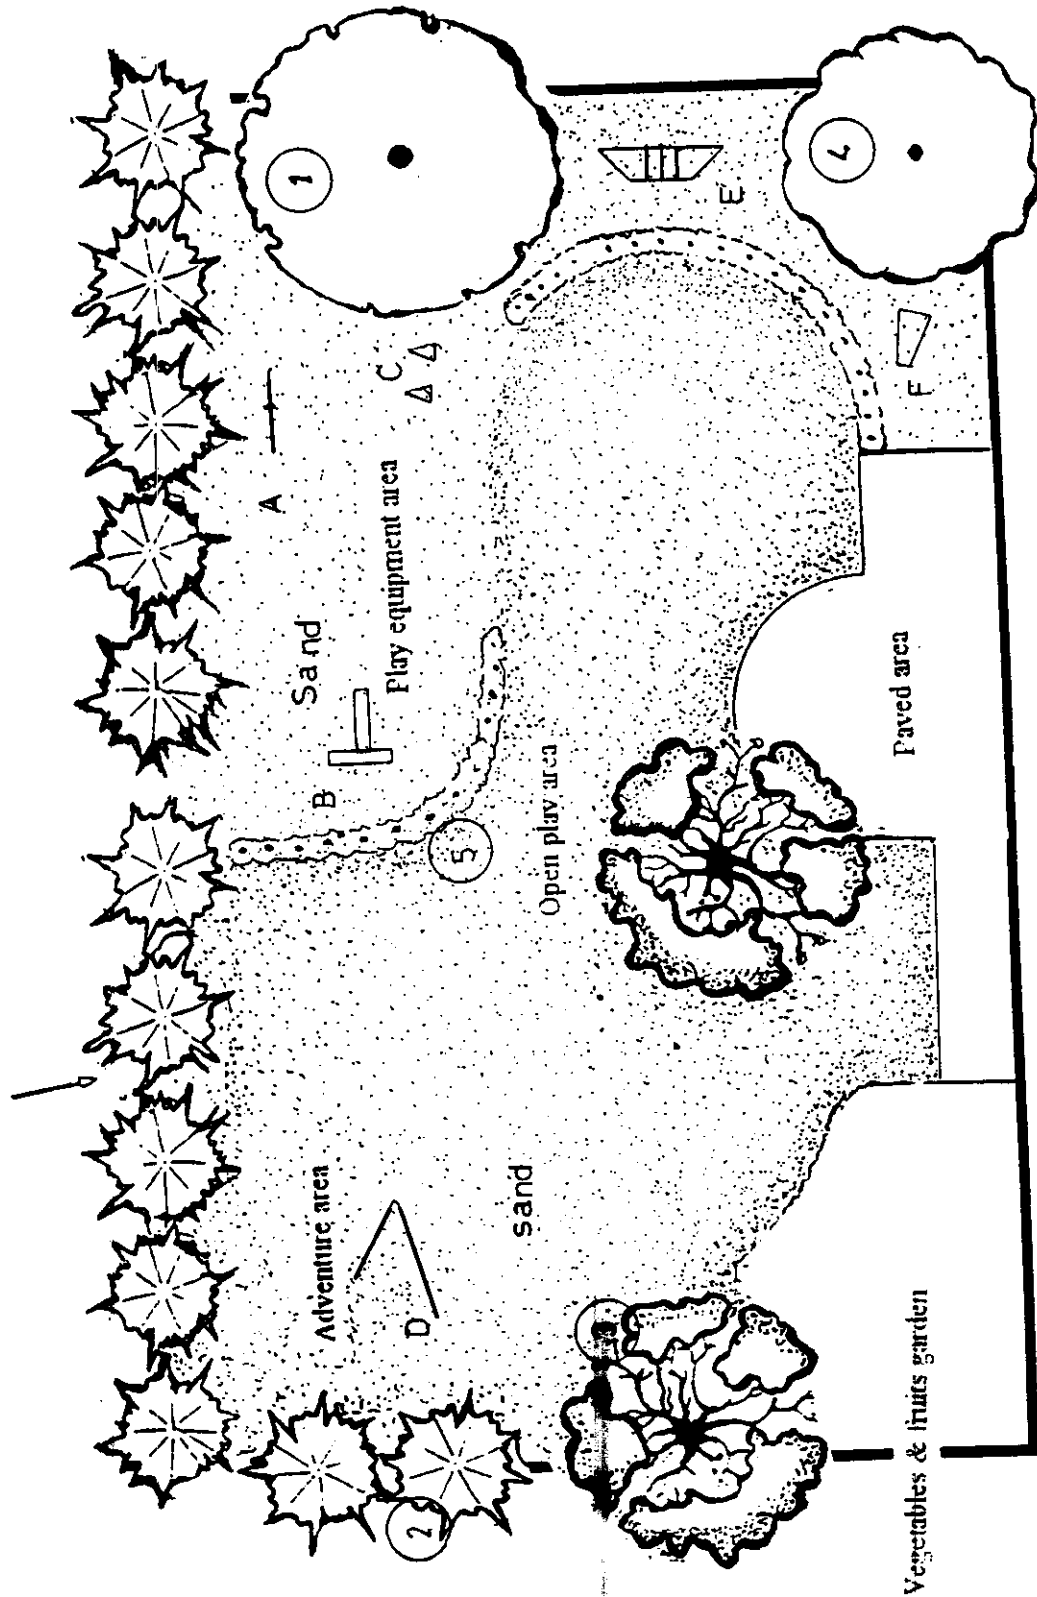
A proposed design for kindergarten garden in an area 400 m.
